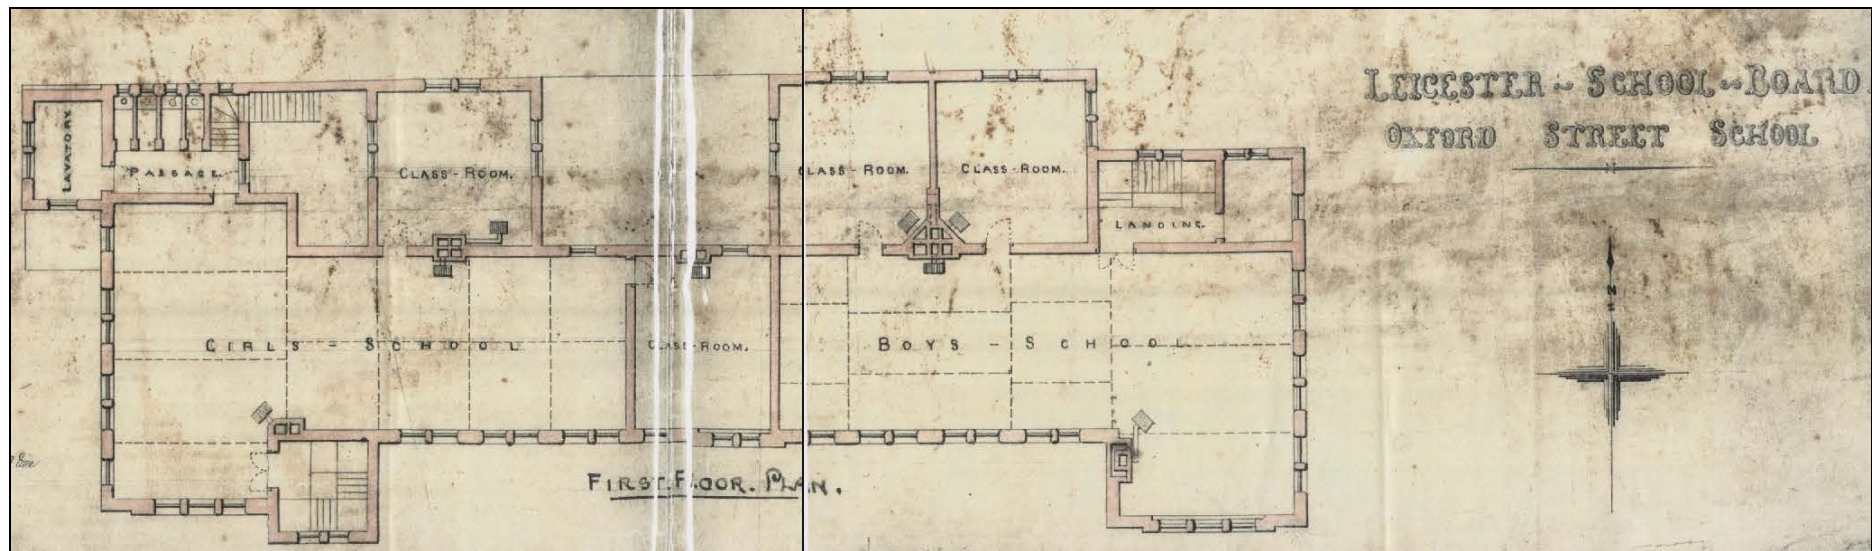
Composite image showing architect's original first floor plan of Oxford Street School. (LBR 1873/2703. Not to scale).
